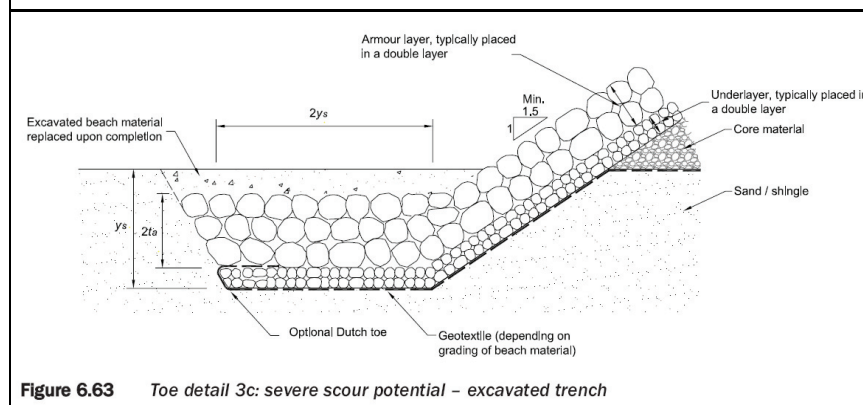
Toe detail 3c: severe scour potential - excavated trench
